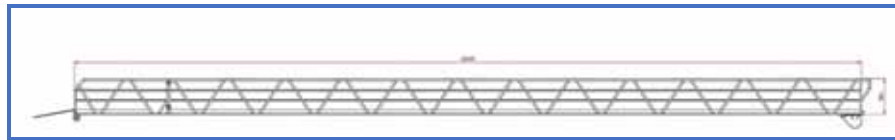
Elevation of Aluminium Gangway Span of 26.0m
